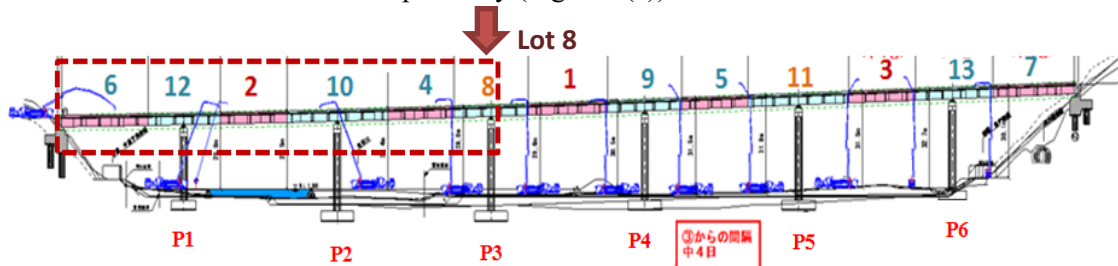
(a) Locations of data monitoring in concrete placement Lot 8 upon Pier 3 and the modeled section of Shinkesen Ohashi bridge
